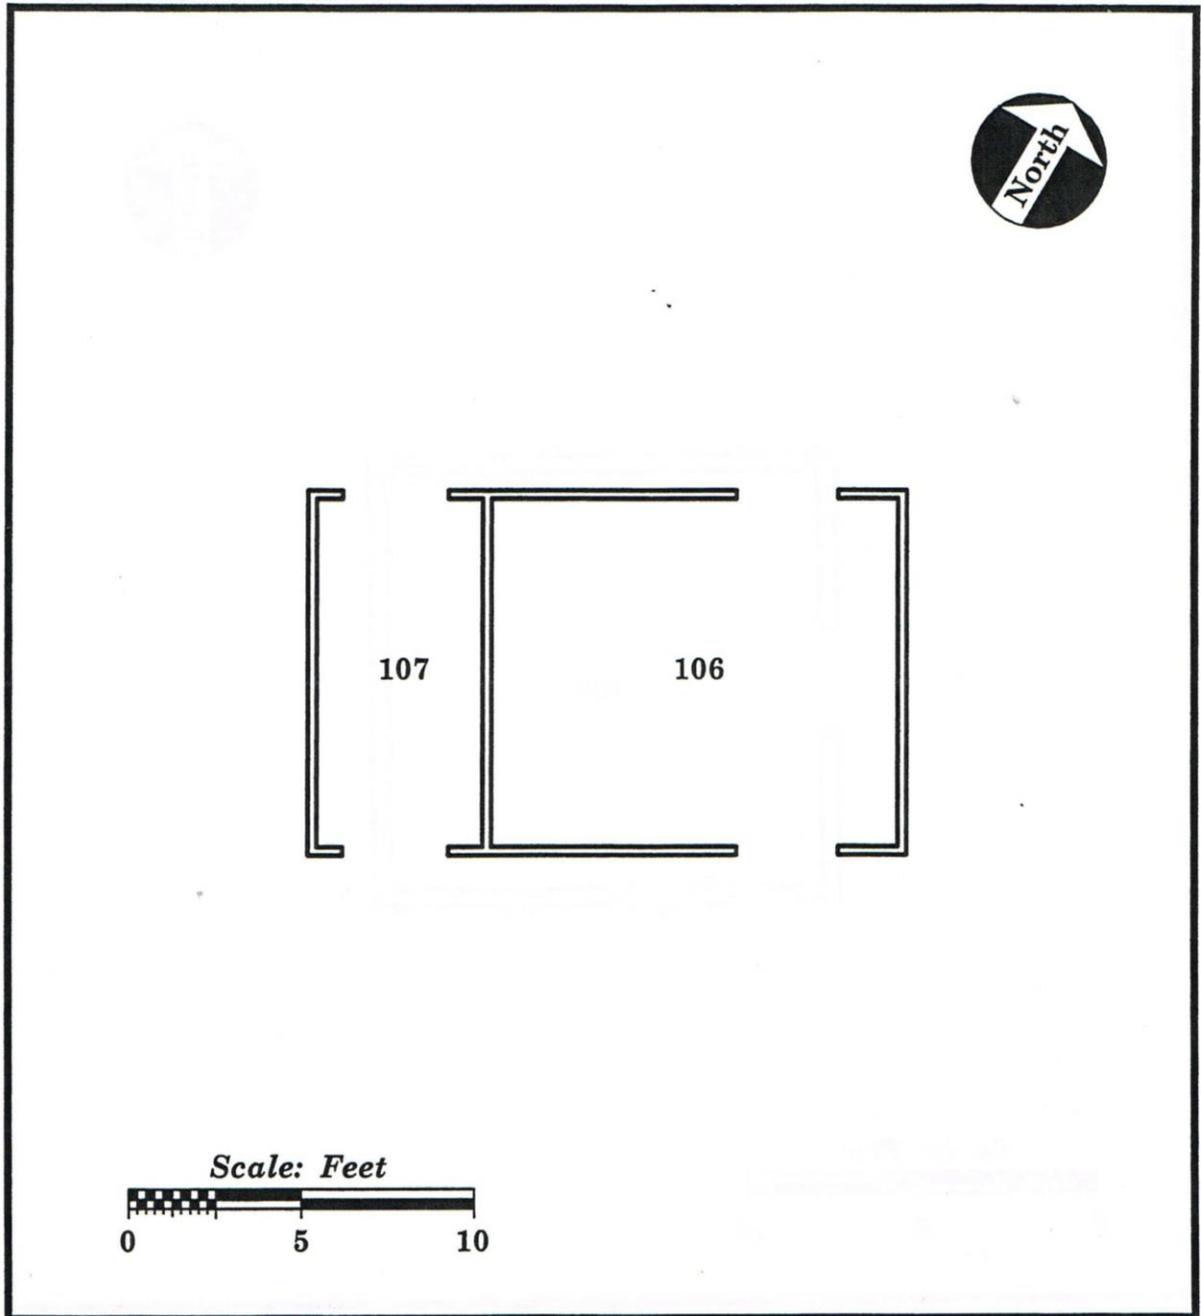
Building 817D, Facility Plot Plan, 1997, LLNL Archives, (Figure A-13)
